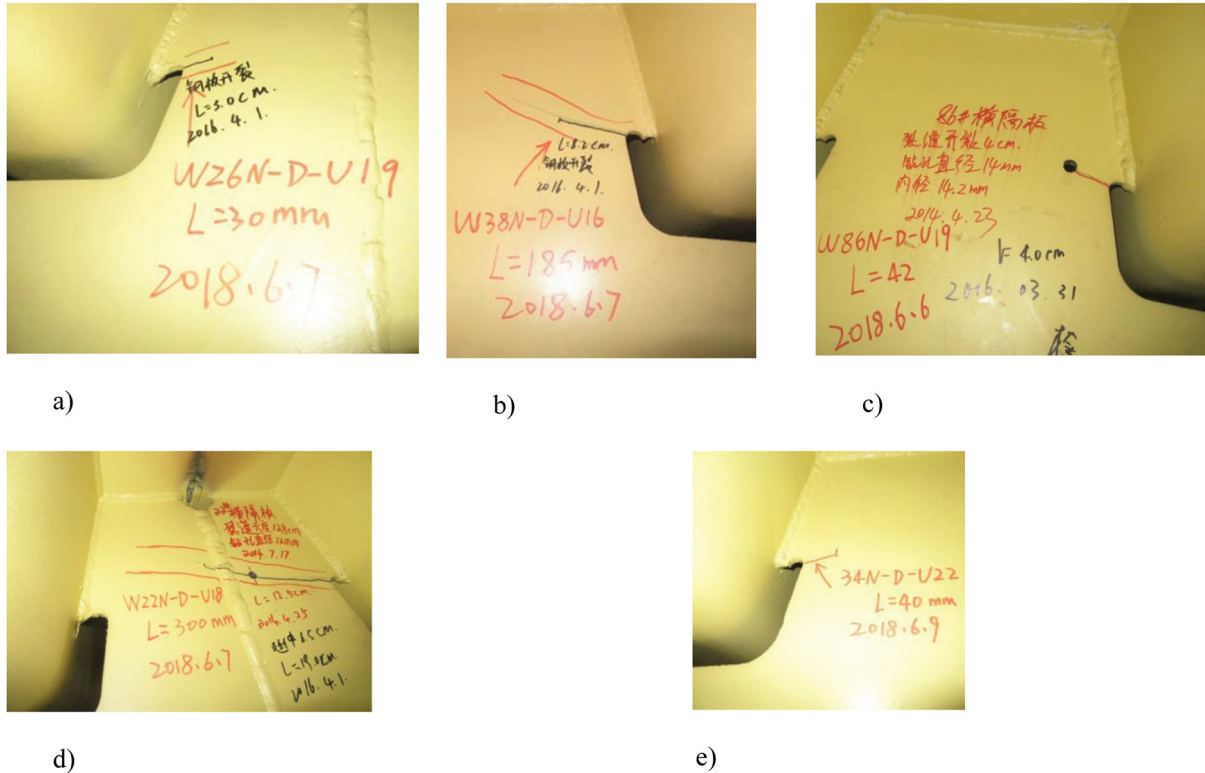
Crack patterns and some development at cutout detail, a) no propagation; b) in propagation; c) arrested by stop hole; d) crack beyond stop hole; e) new crack found in 2018.
